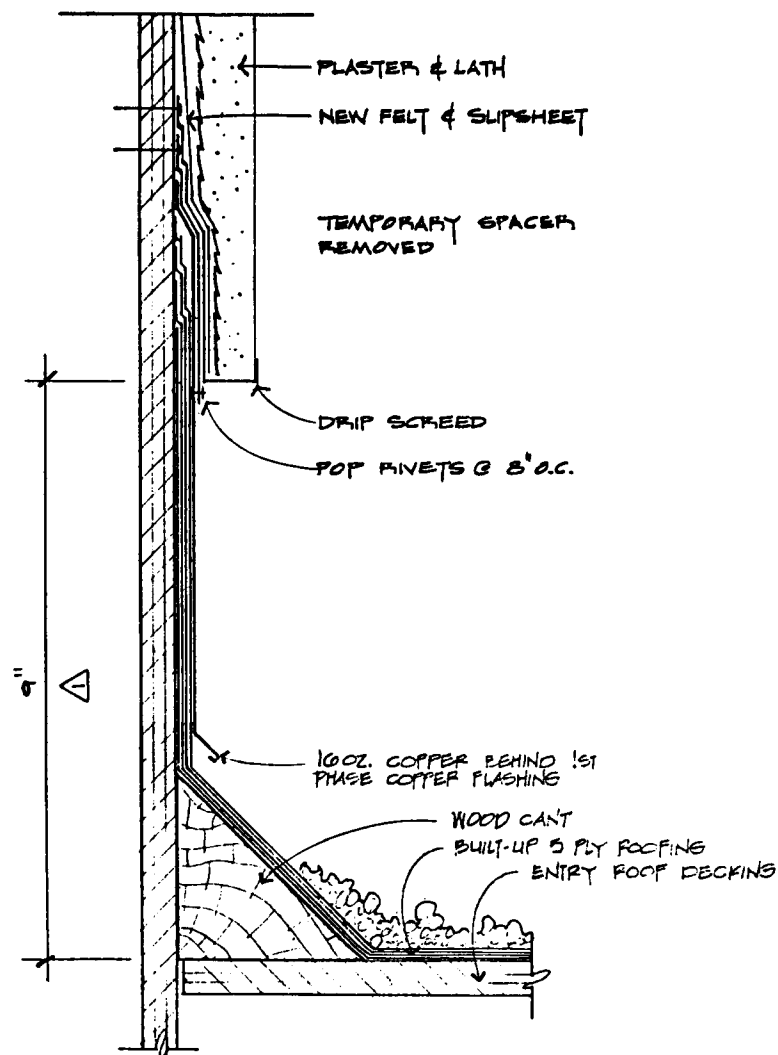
Detail of vertical/horizontal intersection as corrected.
